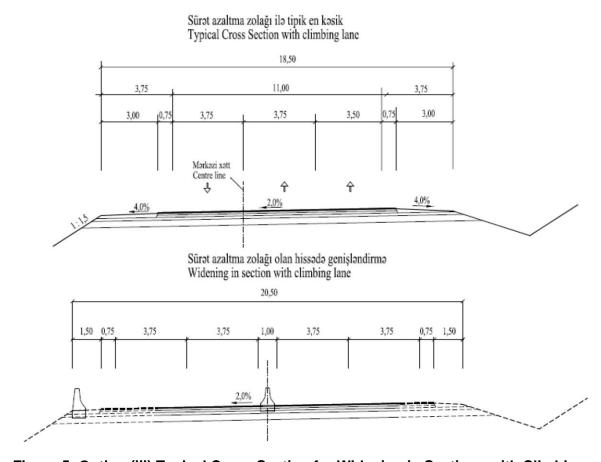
Option (iii) Typical Cross Section for Widening in Sections with Climbing Lane
